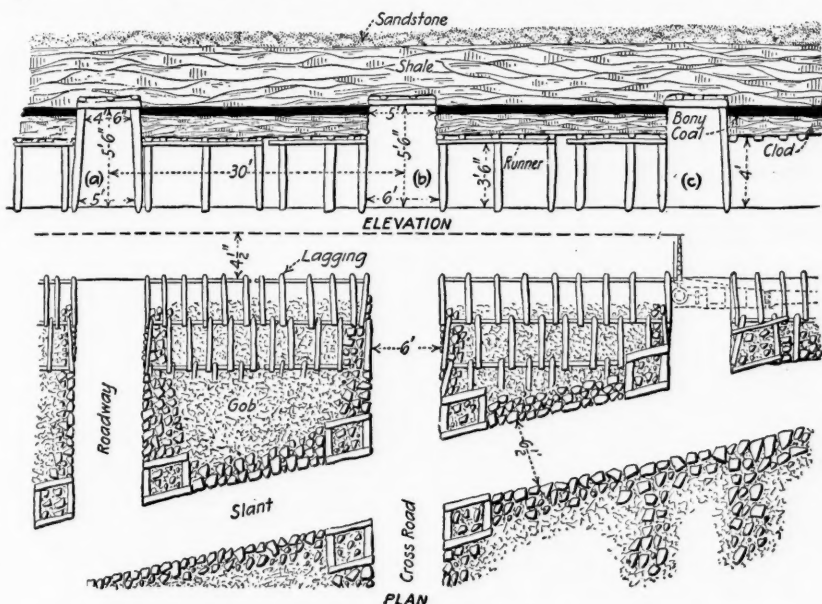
PLAN AND VERTICAL CROSS-SECTION OF LONGWALL WORKINGS, SHOWING MANNER OF PROPPING AND CRIBBING
